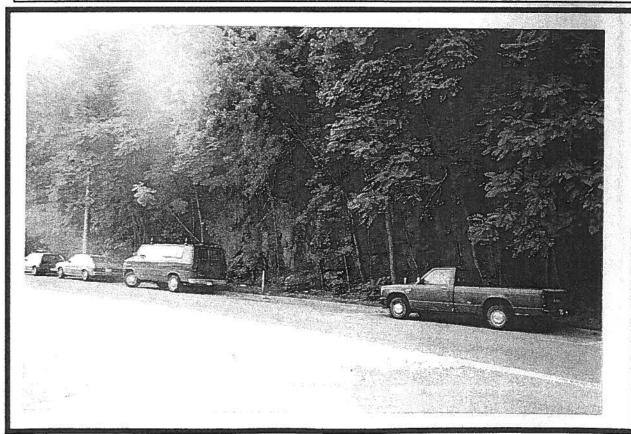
Rock Wall Across the Street (Kisco Ave) from Richard's (Photo 1 of 2)
